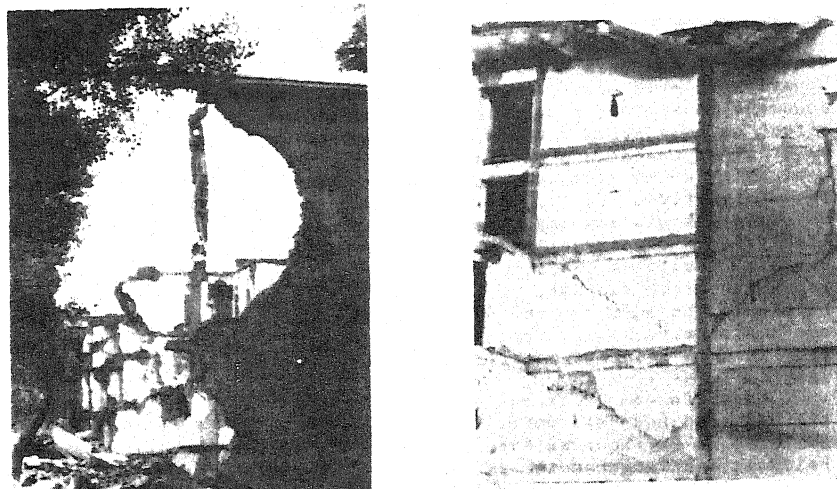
Brick walls damaged in Tangshan earthquake
